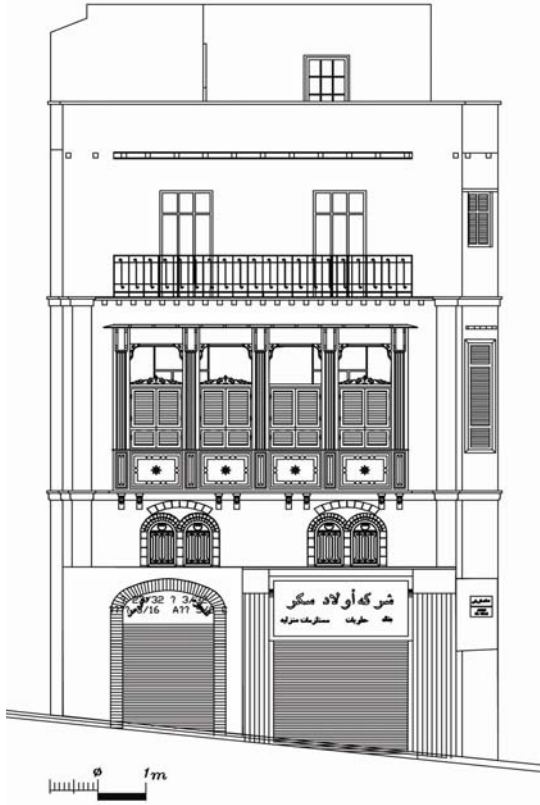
Bayt Sukkar: Elevation of al-Mahgar Street façade
